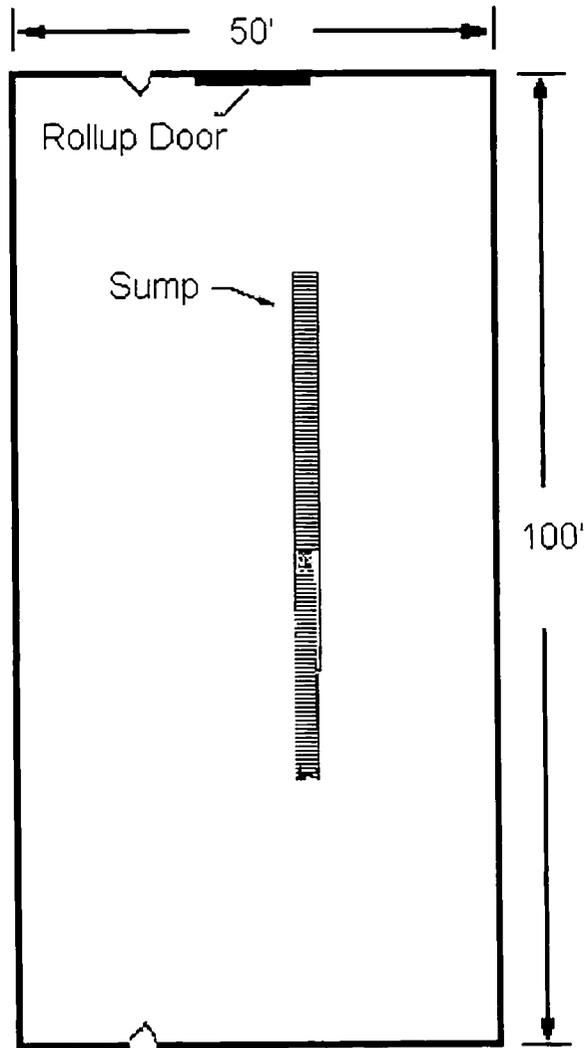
(Proposed) Bulk Contamination Soil Storage Facility, Building 7576.
